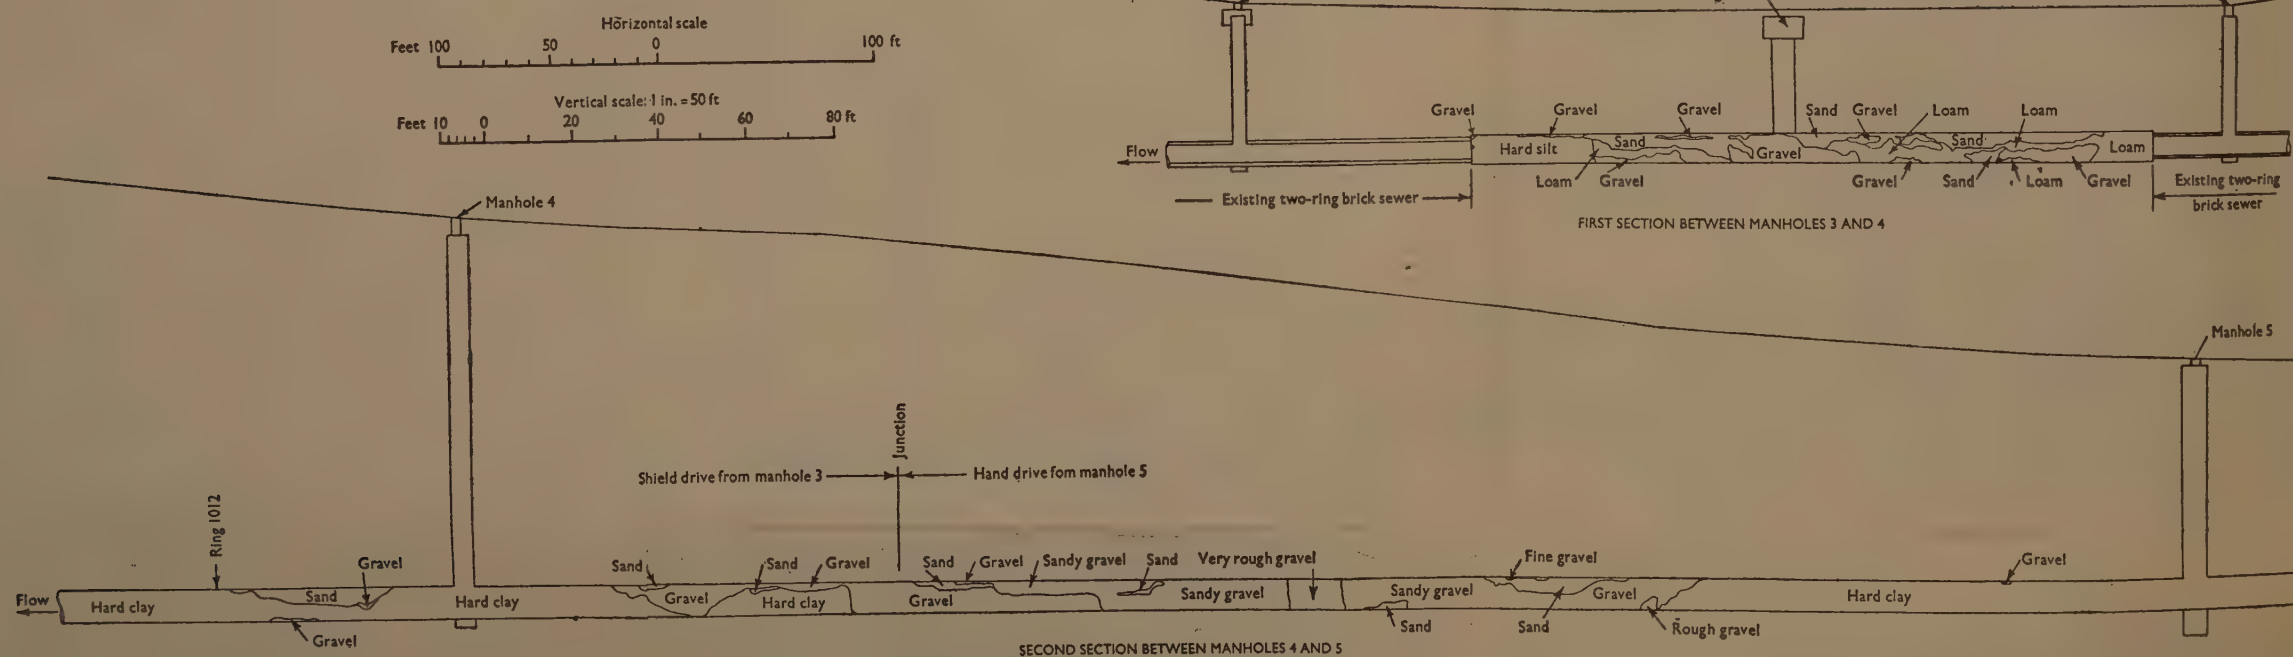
LONGITUDINAL SECTIONS SHOWING GROUND STRATA
